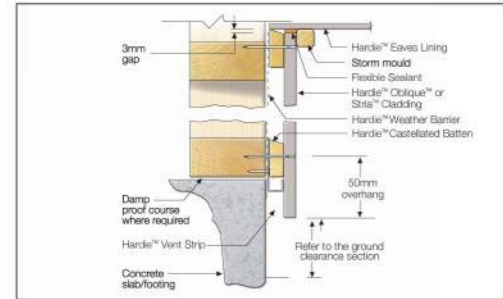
SLAB/EAVE JUNCTION DETAIL
